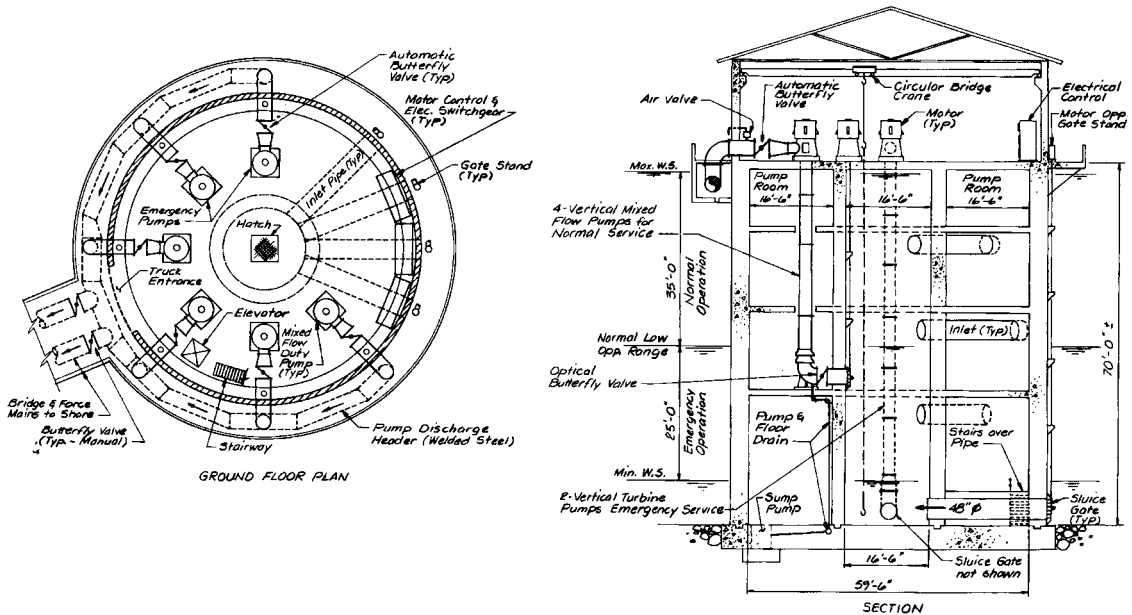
Tower intake. Courtesy of Camp Dresser & McKee.
